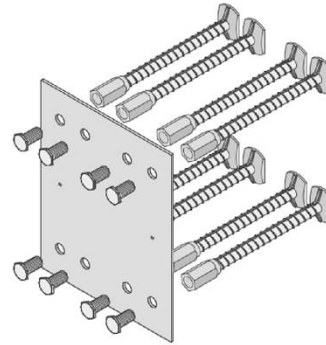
Screw the HSC-B socket bars to the mounting template with flat-head bolts (assembling accessory)
